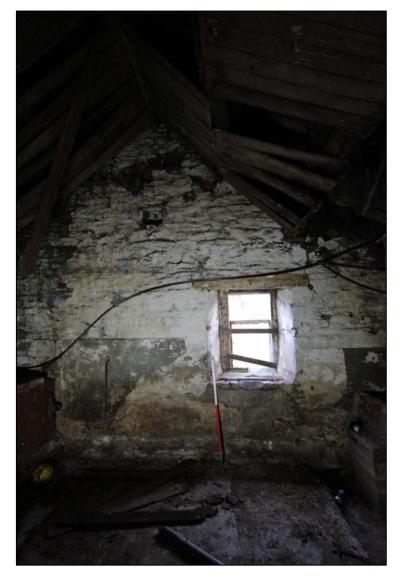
View of the north-east wall within the eastern interior of the north wing, with 1m scale.
